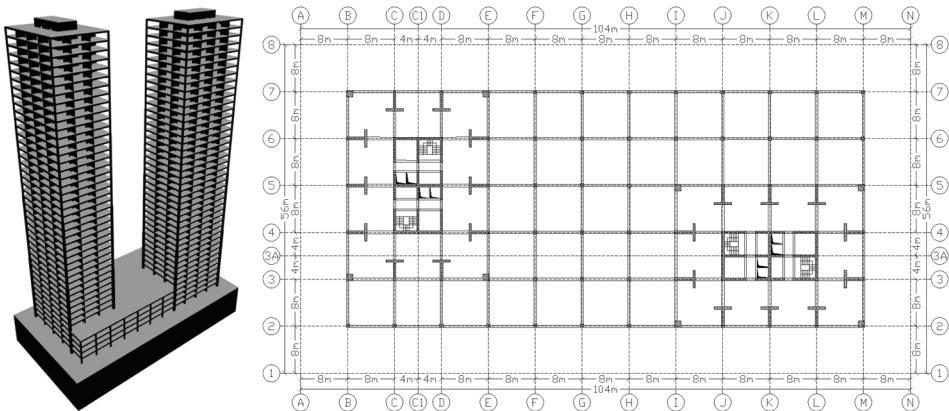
3D view of the structure and typical plan view for connected podium floors.
